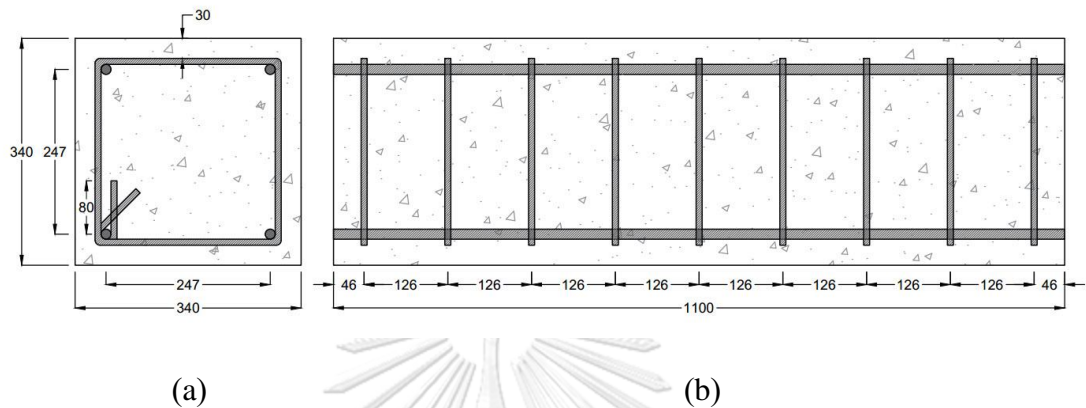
Typical reinforcement details of RC column (column RC-126); (a) cross section; and (b) longitudinal section (dimensions in mm).
